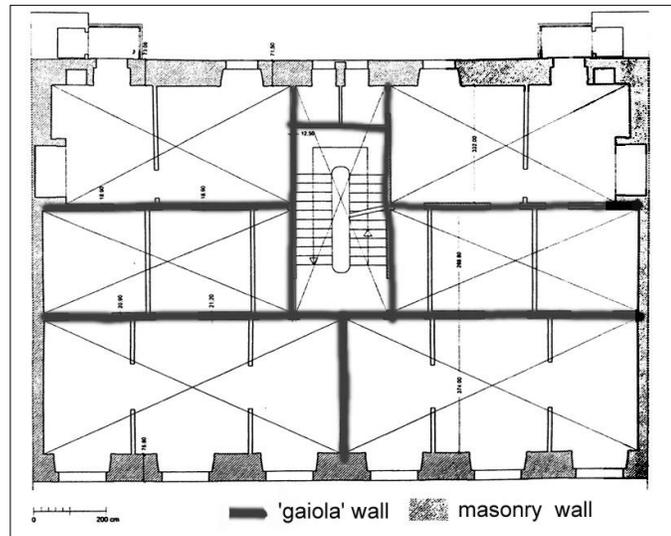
Plan of a typical floor of the analyzed building (adapted from Santos [3])
